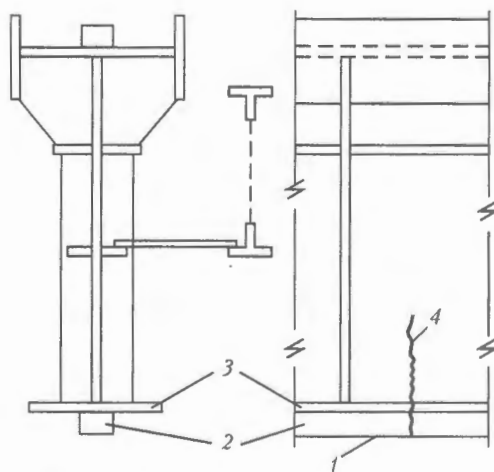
Design stress concentrator formed by a non-welded butt of bars (rails): 1 – narrow gap between edges of bars 2; 3 – beam chord; 4 – crack in chord
